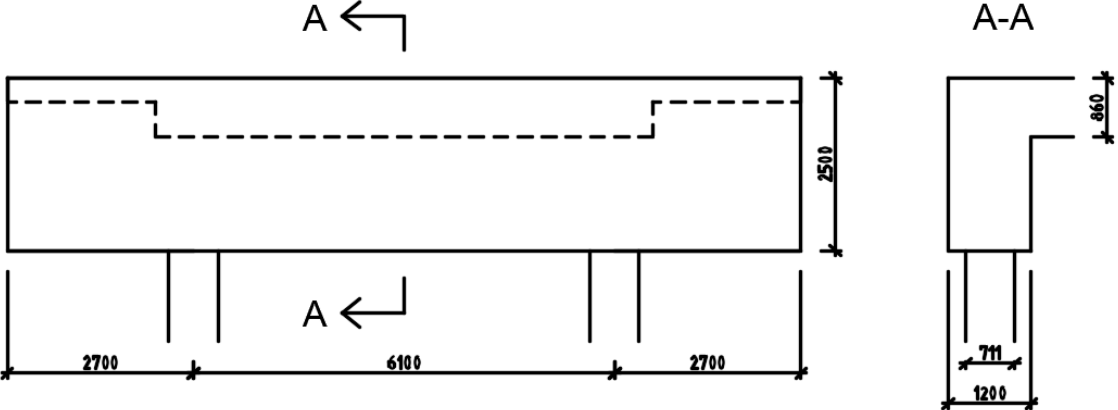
Cross section and section of the backwall, also showing the location of the piles.
